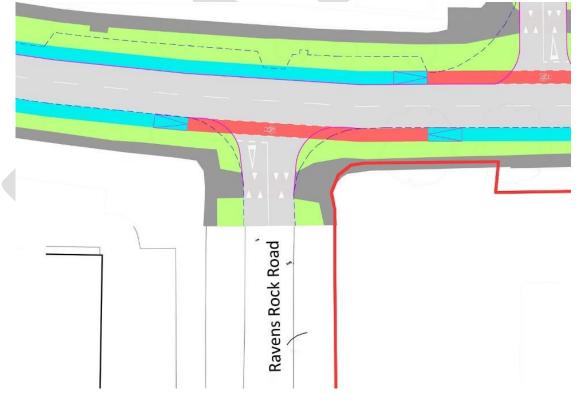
Junction 1: Ravens Rock Road / Carmanhall Road (Priority junction with traffic lane width of 3.25 m)
